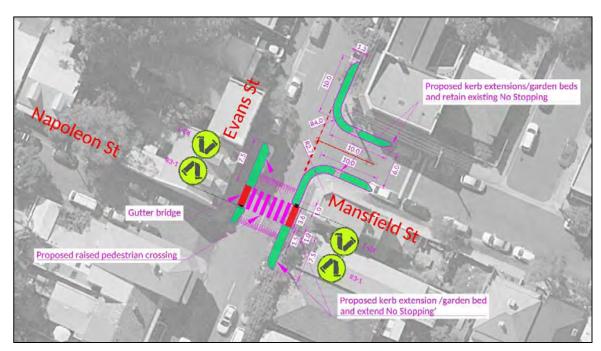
Evans Street / Mansfield Street intersection proposal.
